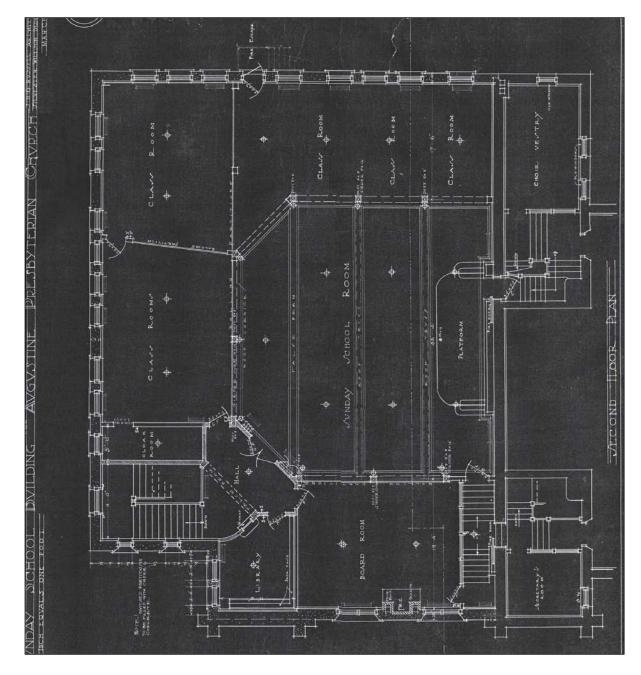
Augustine Presbyterian Church, 444 River Avenue, Architect's Plans for the Sunday School Building, "Second Floor Plan," 1909. (Courtesy of City Archives.)
